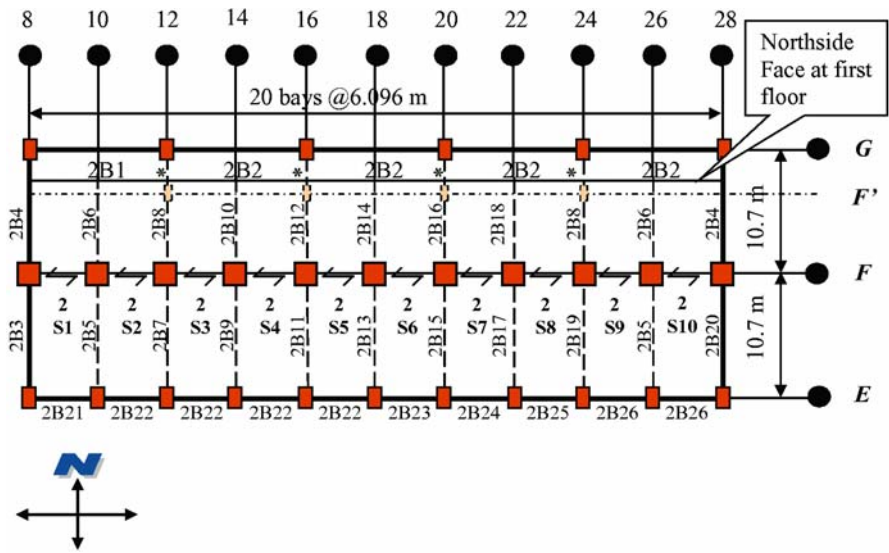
Plan of the first floor (not to scale). Courtesy: Kirkpatrick Consultants, Oklahoma, U.S.A., 2002, T. Bangash, Ph.D. Thesis, London University, 2004
